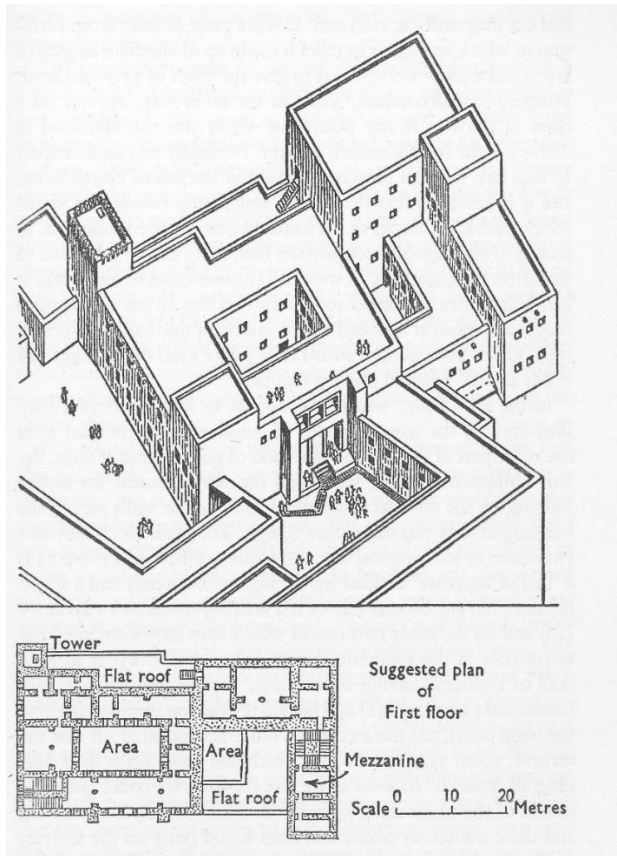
Reconstruction of the palace of Alalakh showing varying roof heights. This helped to ensure entry of light and air circulation in interior rooms (Woolley, 1955, fig. 16)
